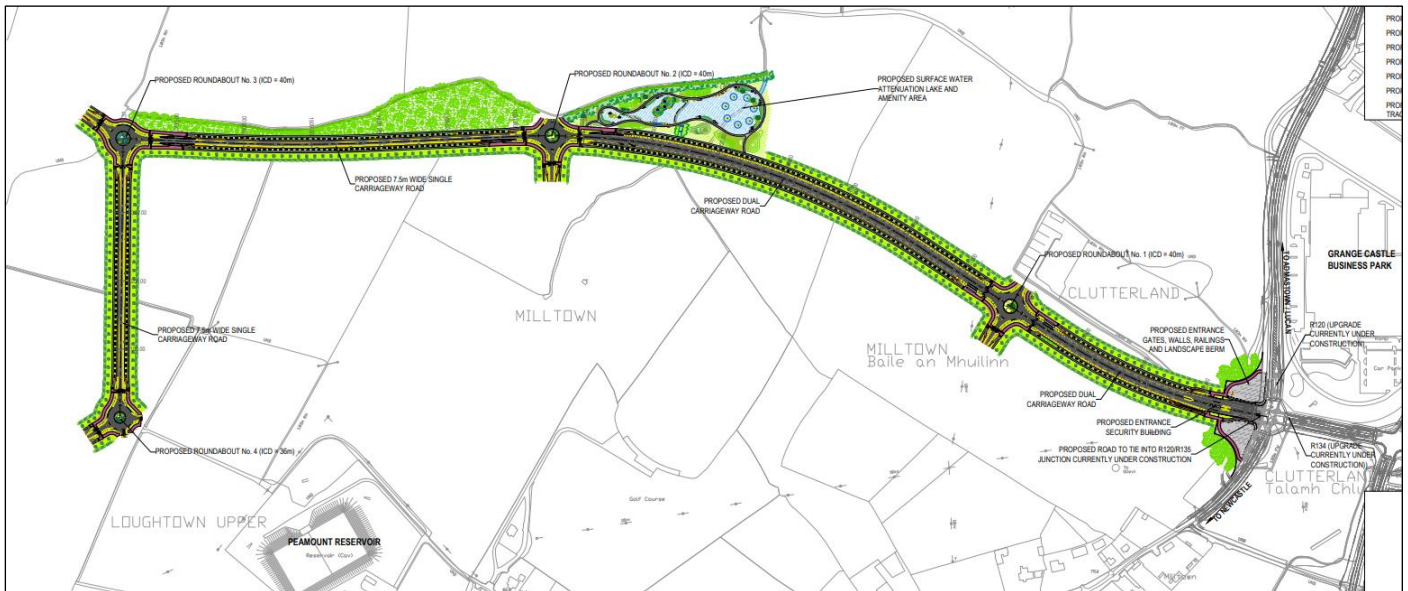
Road layout of part 8 planning application granted under Reg. Ref. SD188/0009
